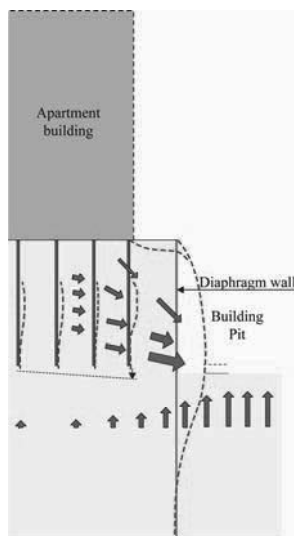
The consequences of the deflection of the diaphragm wall to the apartment building.
